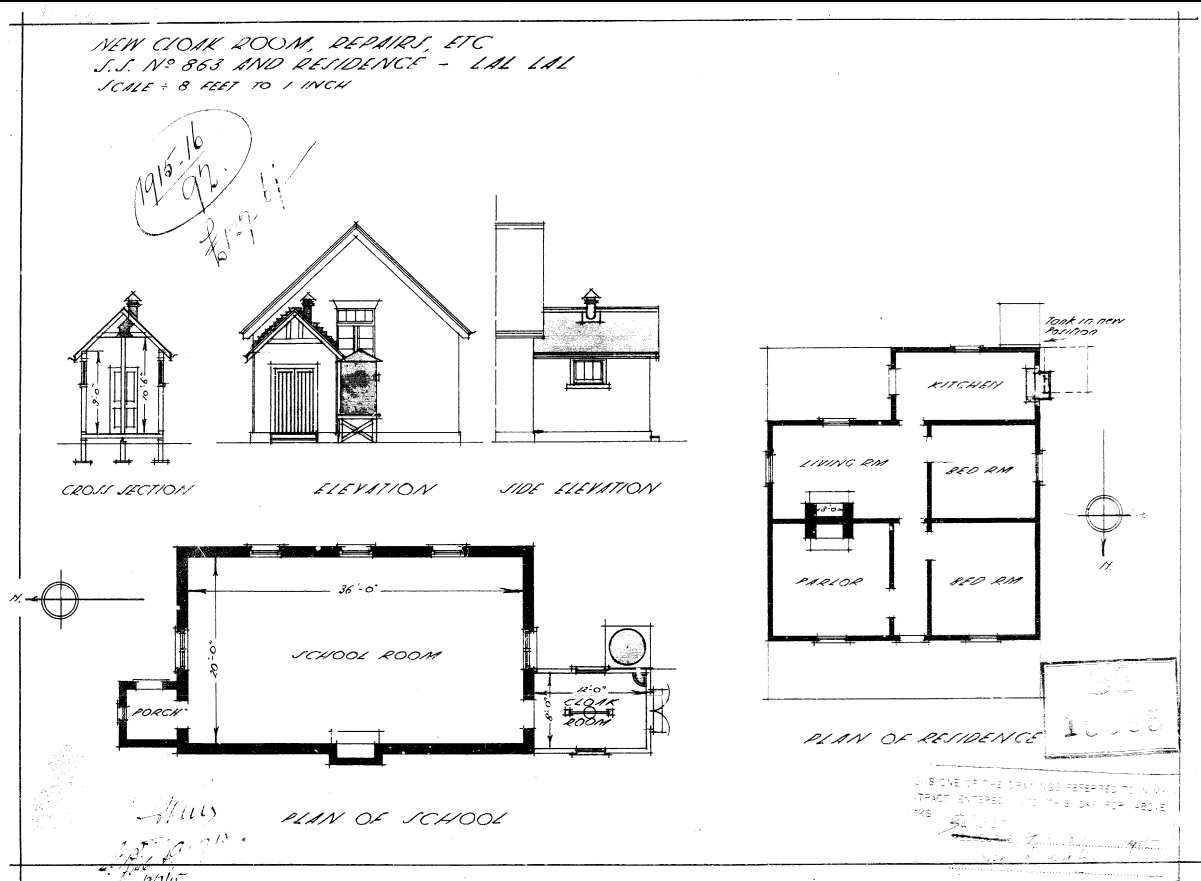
Drawing of Cloak Room Addition to School Building & Water Tank Relocation to School Teacher's Residence, 1915.
